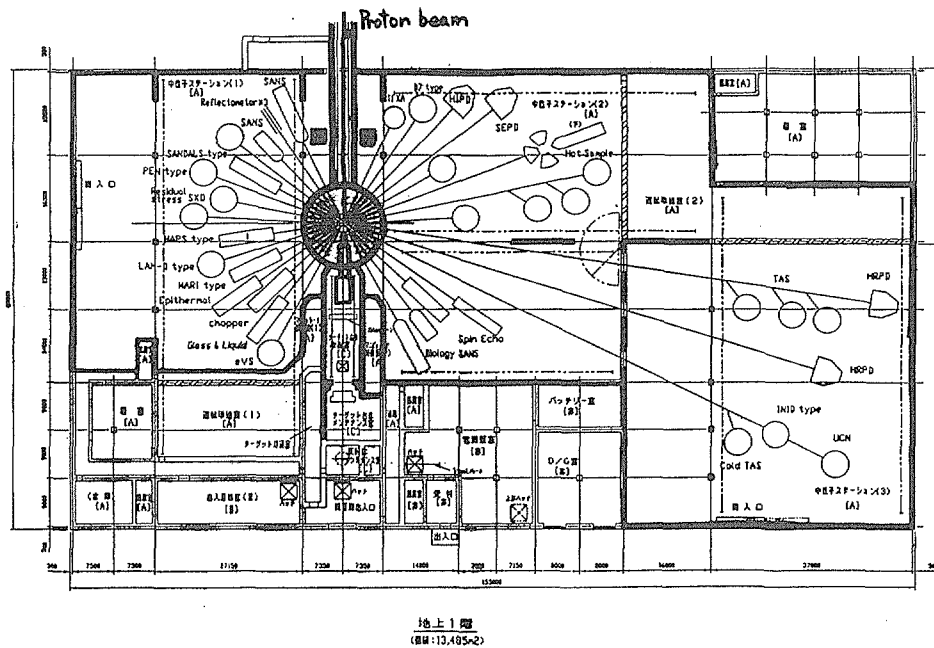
A plan of neutron beam line layout of the neutron scattering facility
